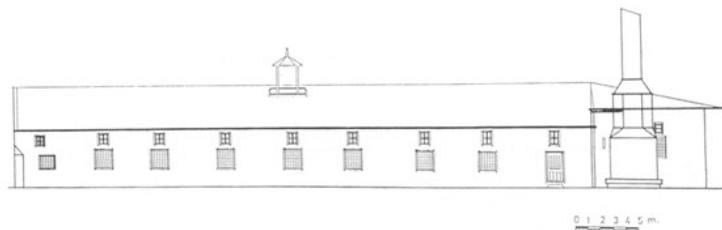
Southern Wall (Altinsapan, 1999: Drawing 4)
